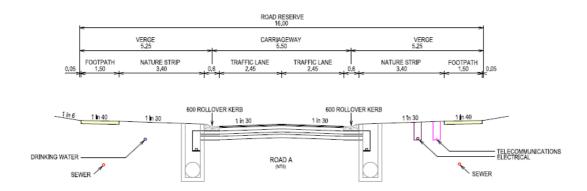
Proposed Subdivision Typical Road Cross Section
